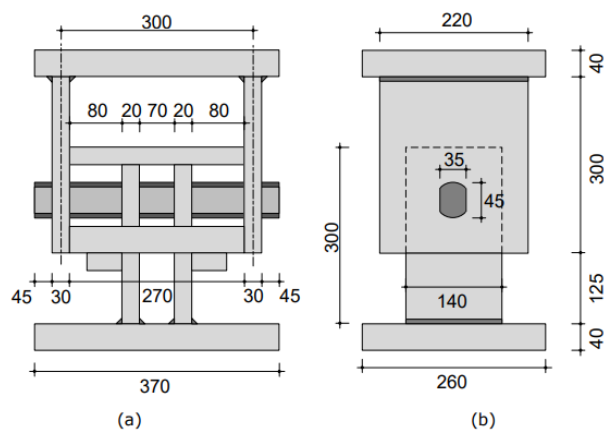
Dimensions (mm) of DRBrC with spacing D1 (=70mm): (a) Top view, (b) Lateral view (DISSIPABLE, 2021).
